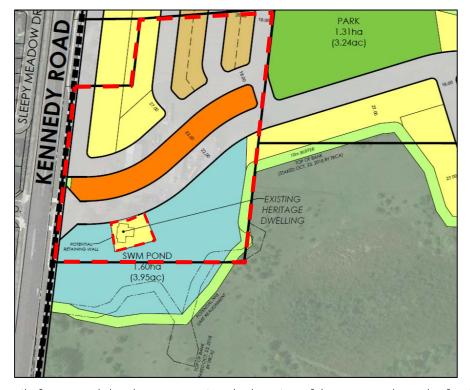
Detail of proposed development noting the location of the proposed new lot for the heritage building, to be retained (GSAI, 2020)
